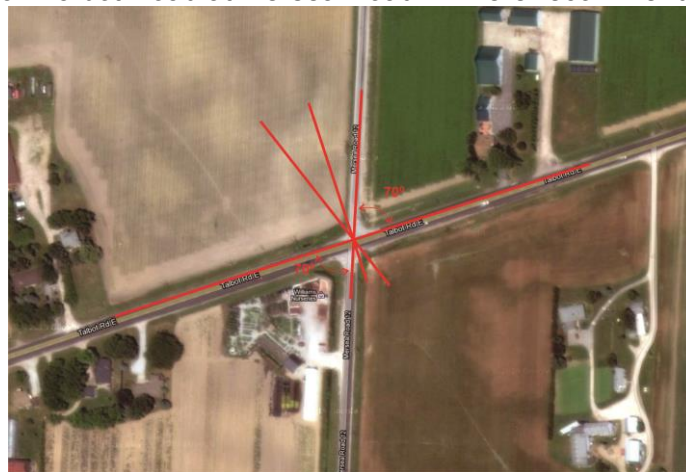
Improvements to the Intersection of Mersea Road 12 and Talbot Road
